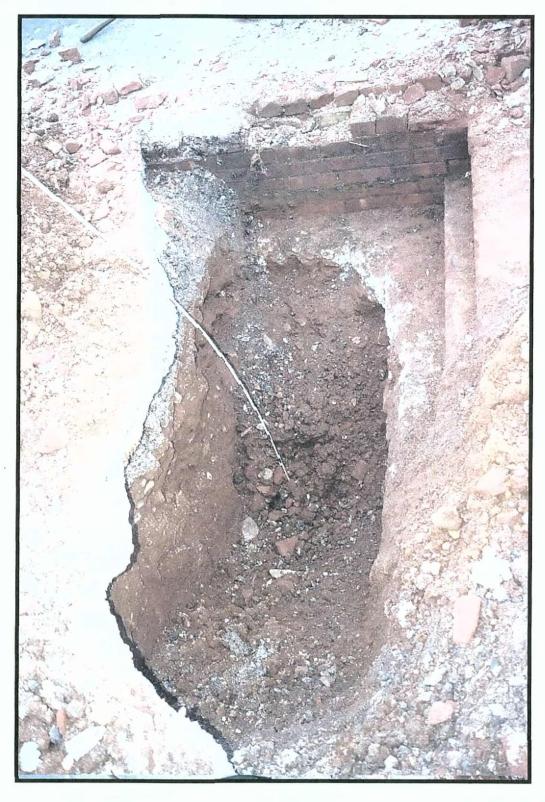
Backhoe Trench 8 - Southwest Corner Building 8 View North
